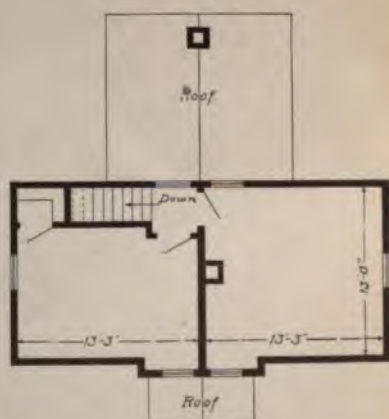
HOUSE FOR EMPLOYEES, PLAN E
